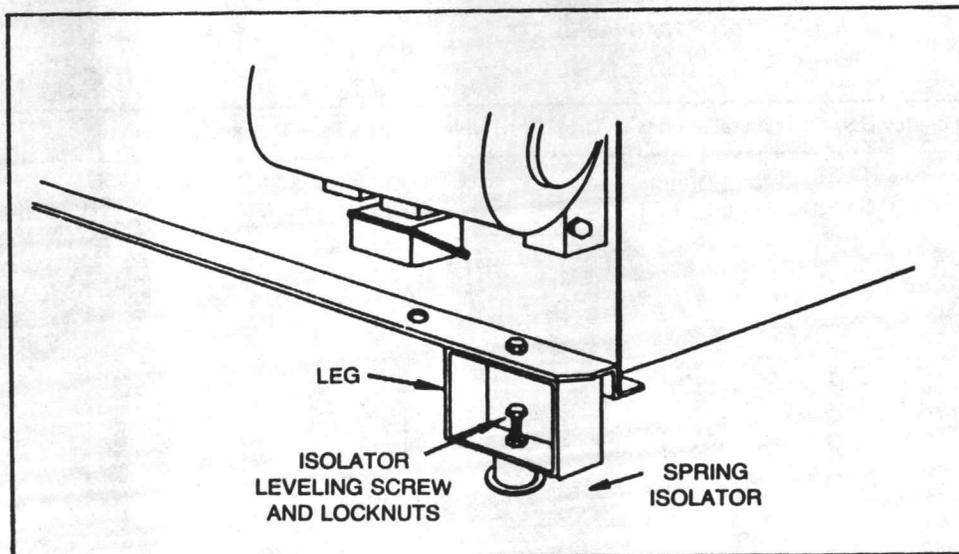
Attaching the Mounting Leg and Spring Isolator to the High Pressure Sprayed Coil Unit
